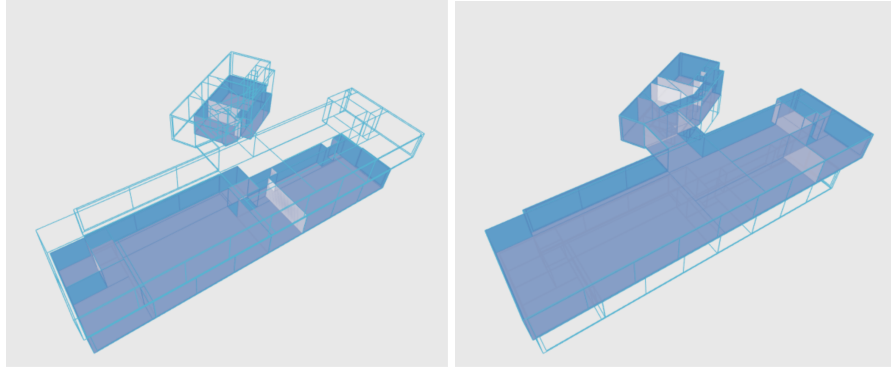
HVAC air side zone layout. Left: first floor, Right: second floor
